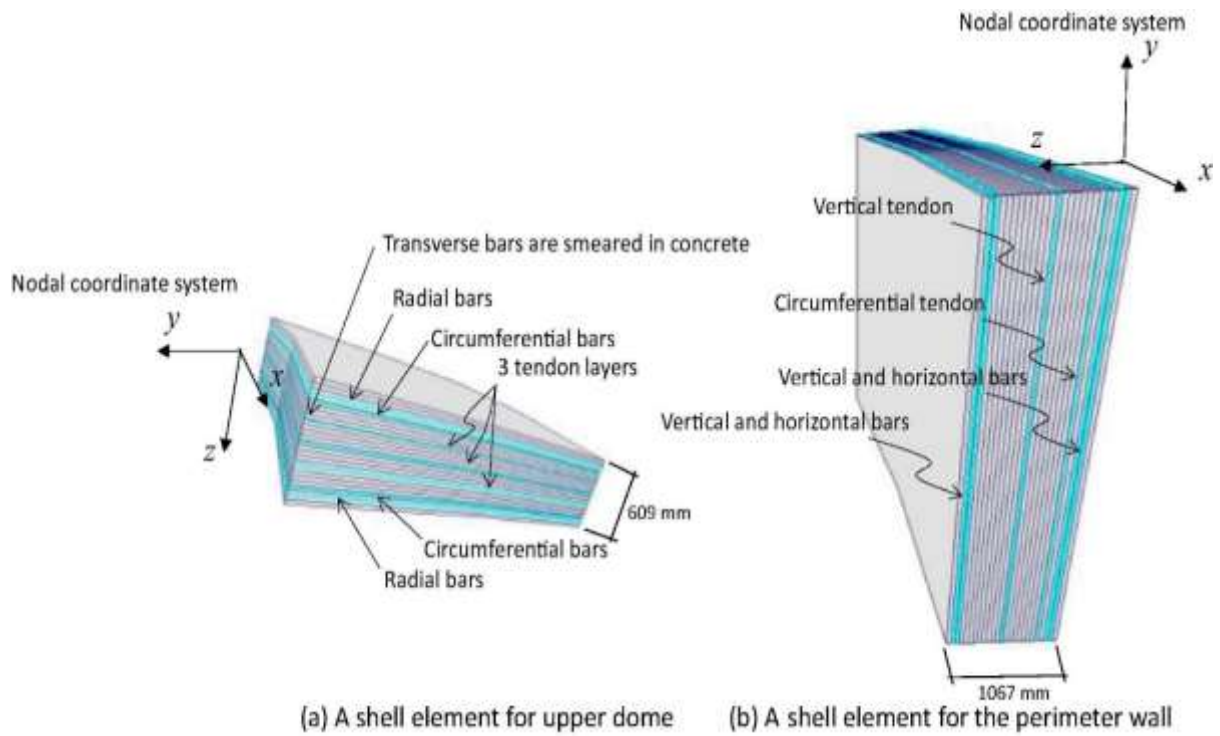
Typical layout of Dome and Wall of Nuclear Containment (Huang *et al.*, 2017)
